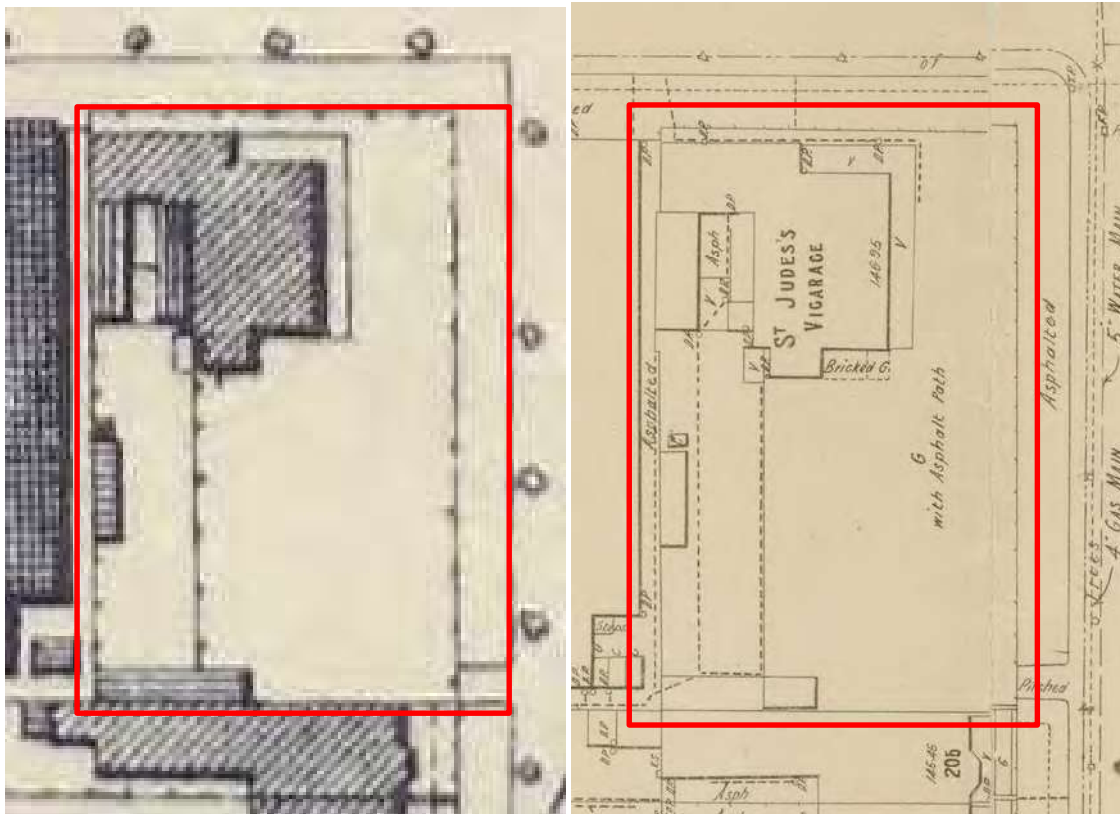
MMBW 160:1 plan no. 30, 1896 (left) and detail plan no. 1184, 1897 (right), showing brick vicarage and other timber buildings on subject site (indicated), 1896. North is at the top of the image, with Drummond Street at right
